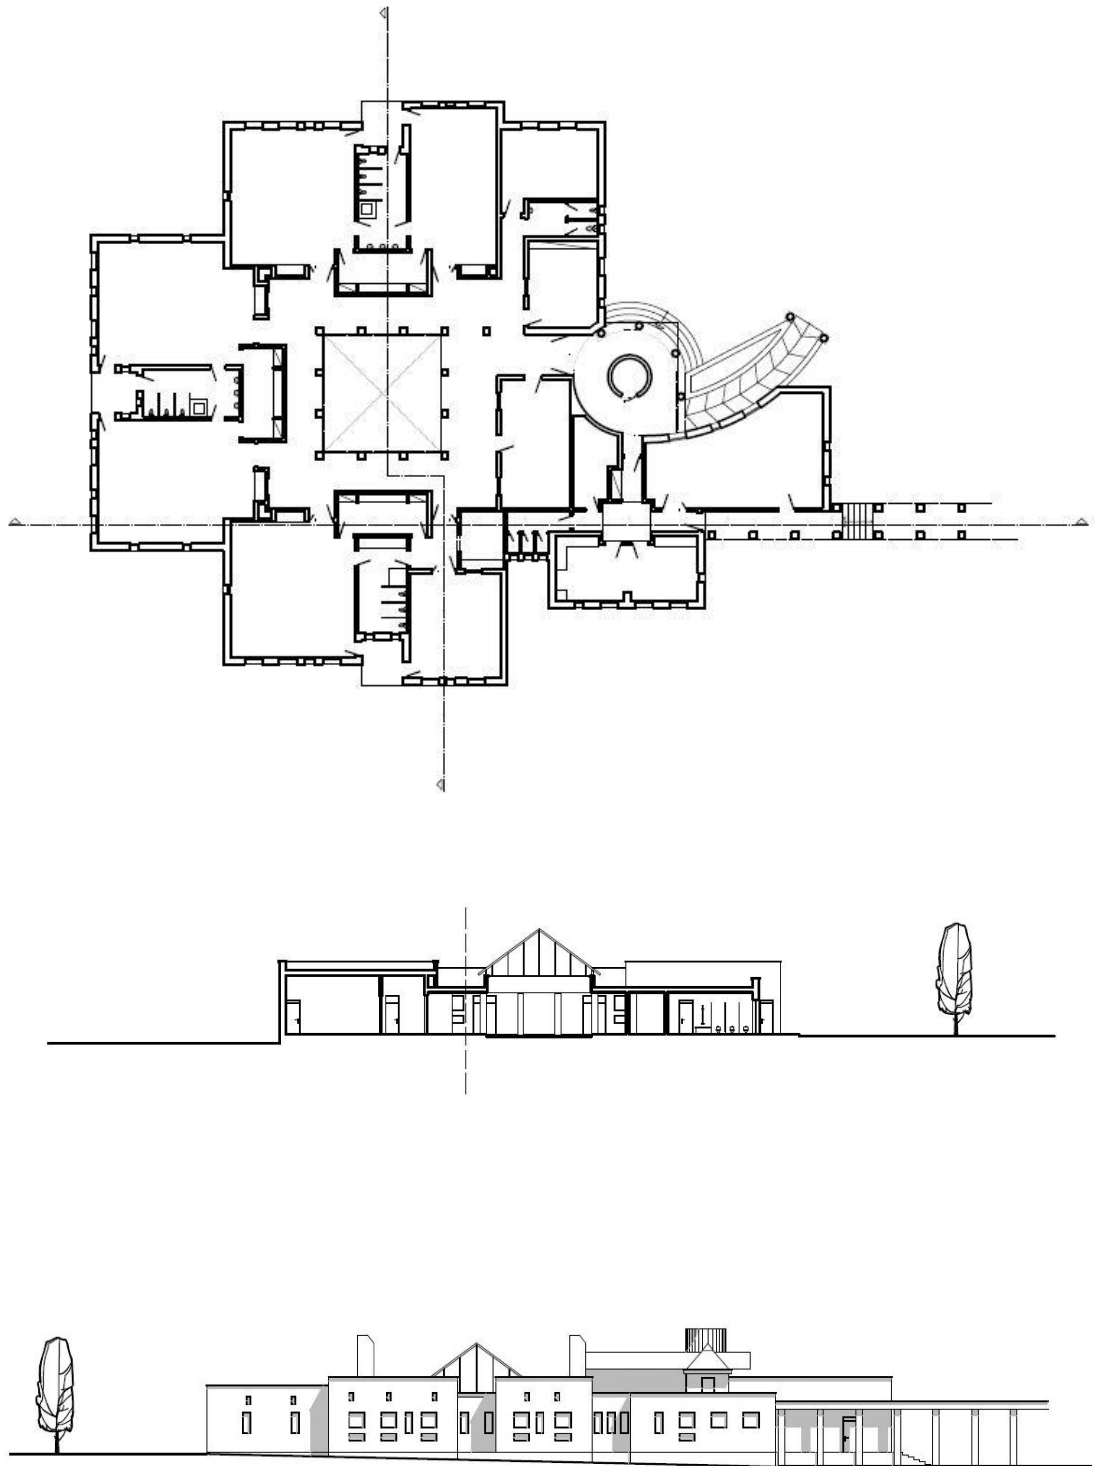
The Architectural Documents of S.O.S Kindergarten. In order from top to bottom: Fround Floor Plan, Longitudinal Section, Southern Elevation (Author-2016).
